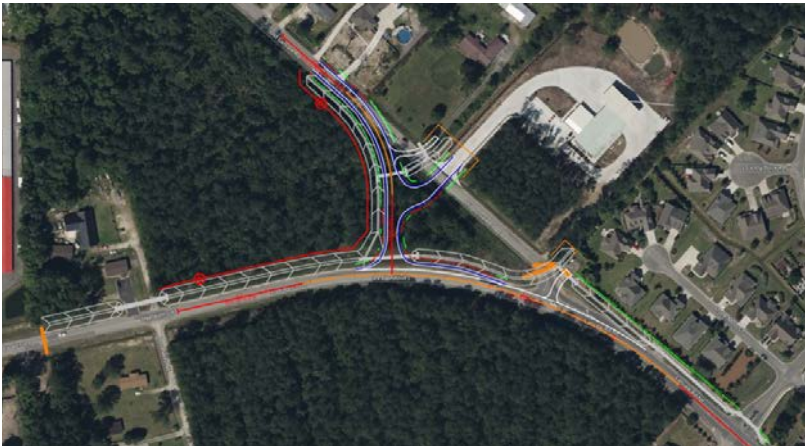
Intersections of Lanvale Road/ Springstone Road and Lanvale Road/ Old Lanvale Road
